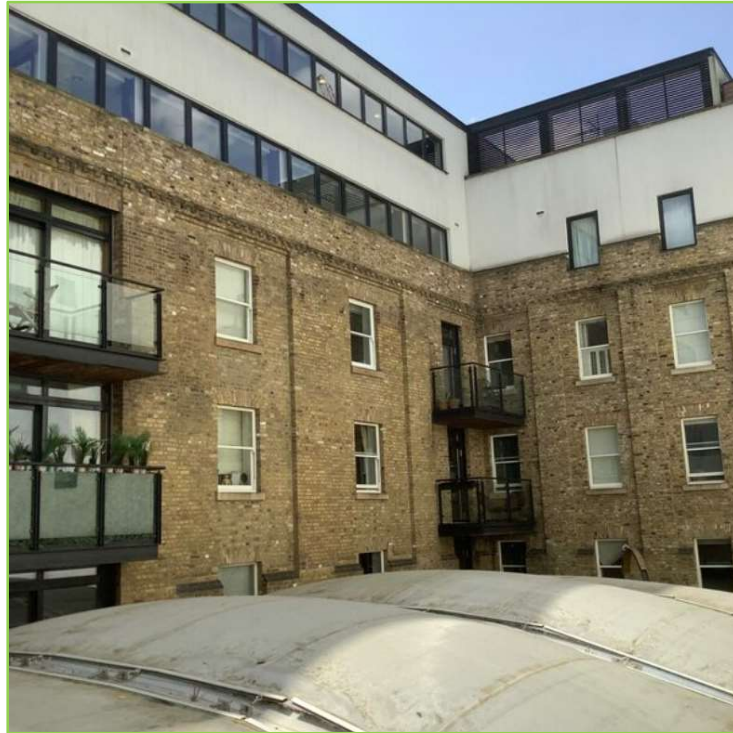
Courtyard North-east facing elevation showing masonry and render system.
